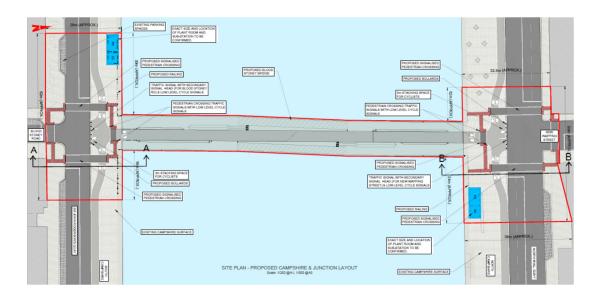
Proposed Campshire and Junction Layout - showing segregated cycleways and footways on the bridge and campshire
